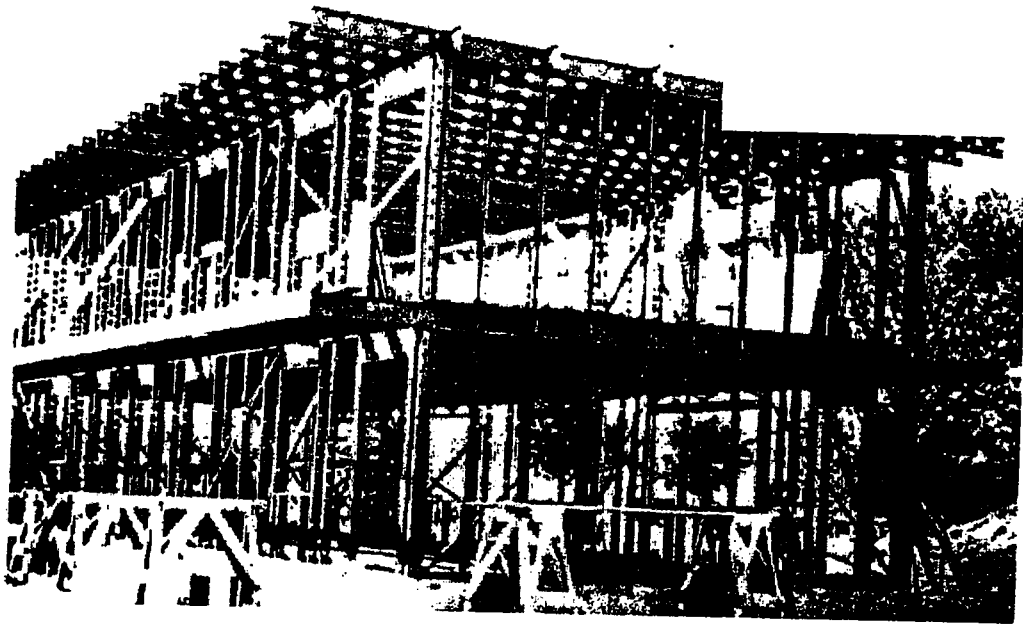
Cold-formed steel structure (Pen Metal Company)
